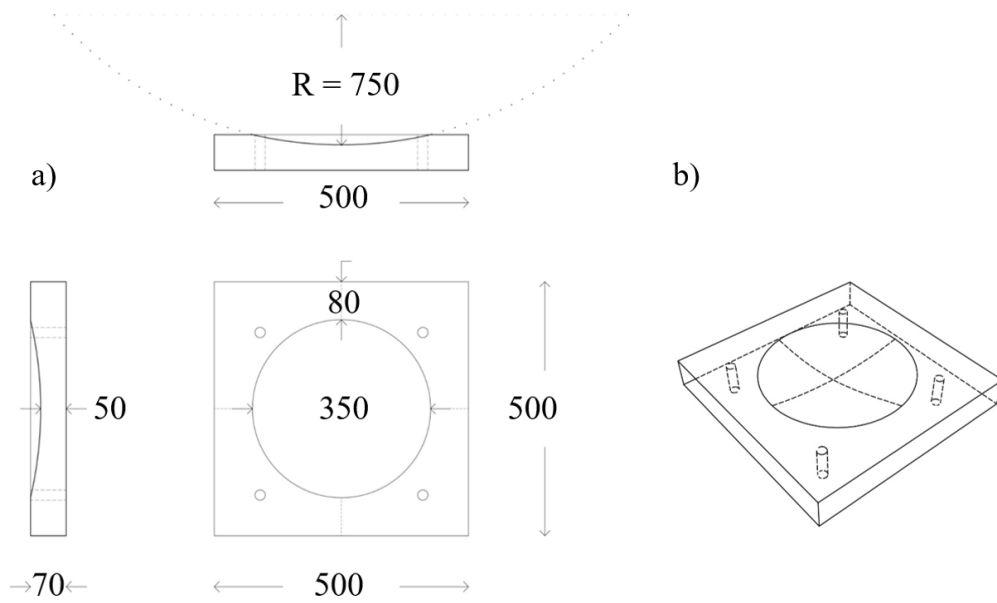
Schematic representation of the utilized concave concrete plates (dimensions in mm); a) Plan and side views, b) 3D view
